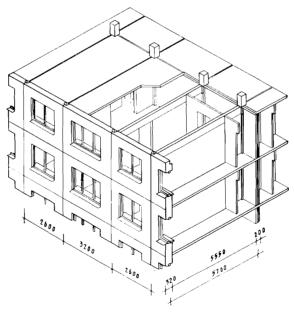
Frame-panel building with partial frame and transverse collar beams, spaced at about 3 m.
